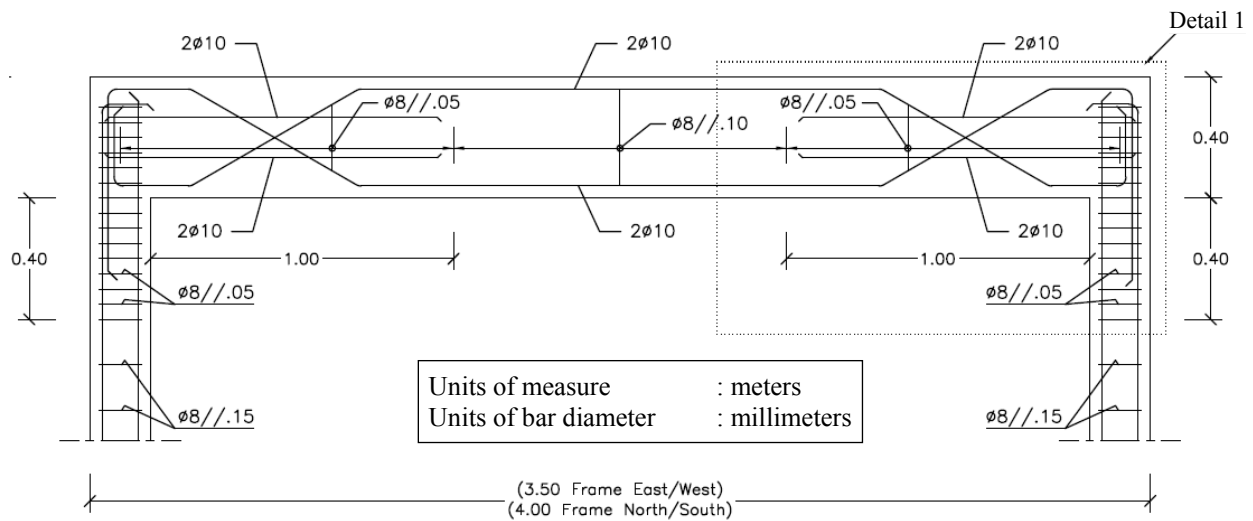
Reinforcement details of Lisbon 3D frame model B (taken from: 15th WCEE Blind Test Challenge Report, 2012)
